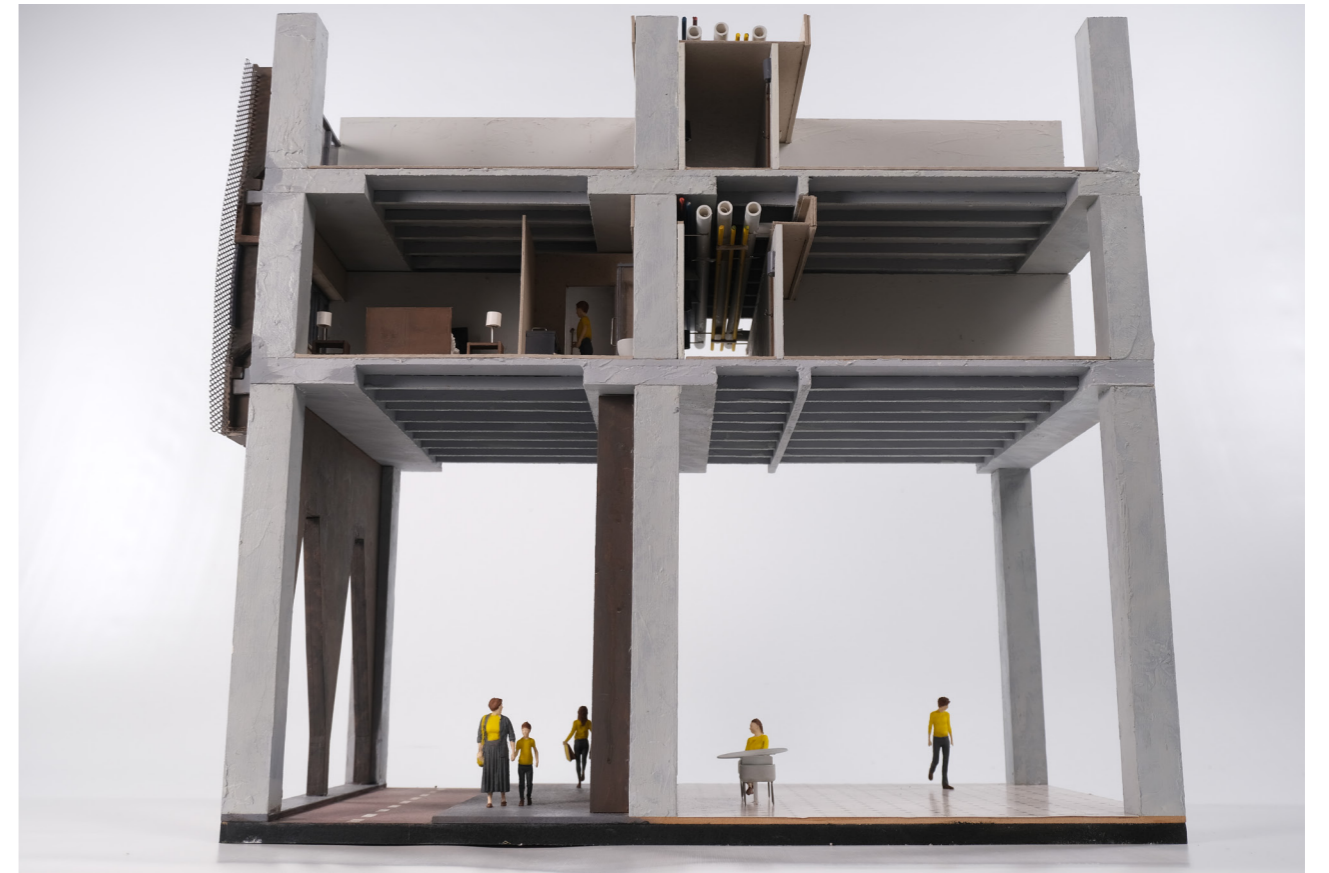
Facade fragment model 1:25, showing floor composition (Lars Haga, 2026)
